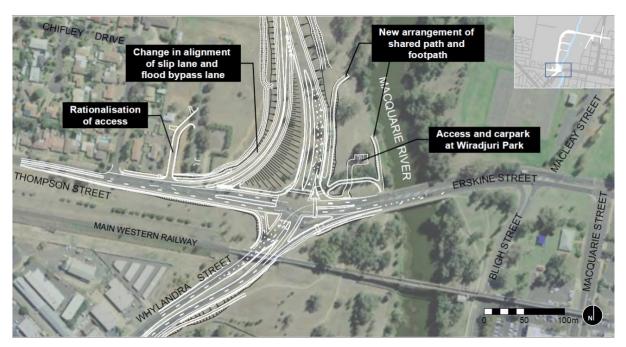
Modified Newell Highway/Thompson Street intersection
